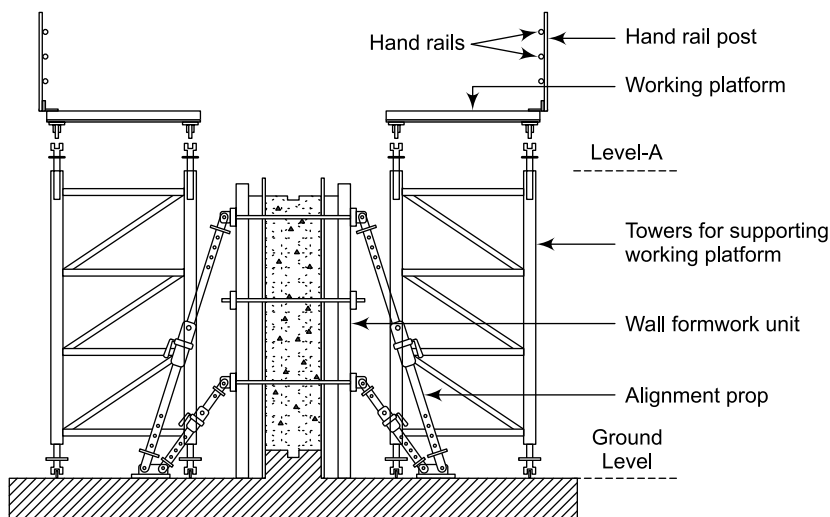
(a) Step 1 of Traditional Wall Formwork-Casting of First Lift of the Wall.
